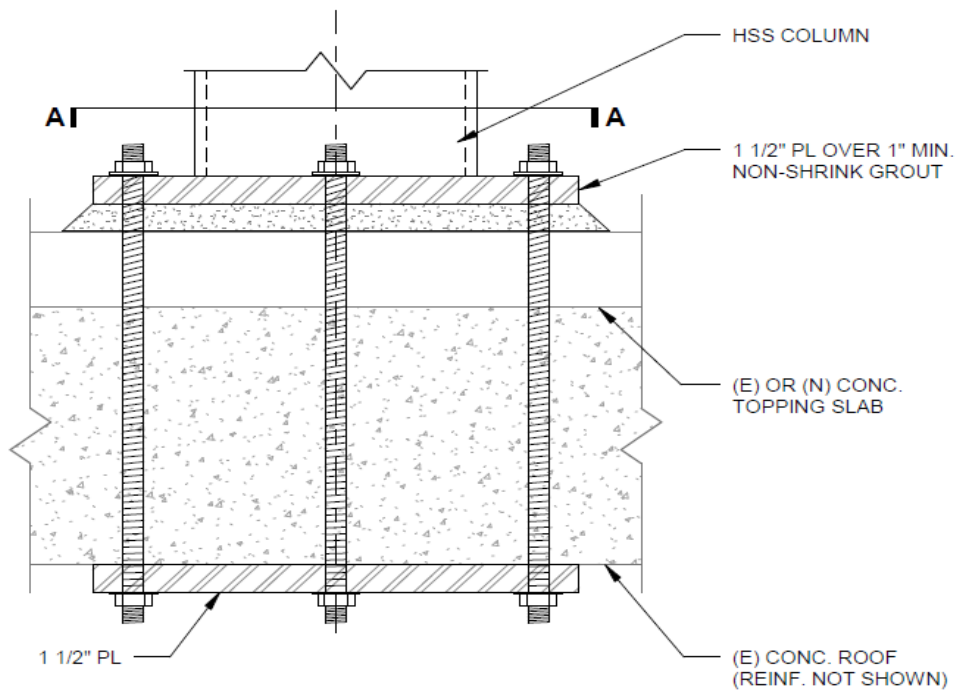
Steel Structure Column Anchoring Detail (YEI 2016)
